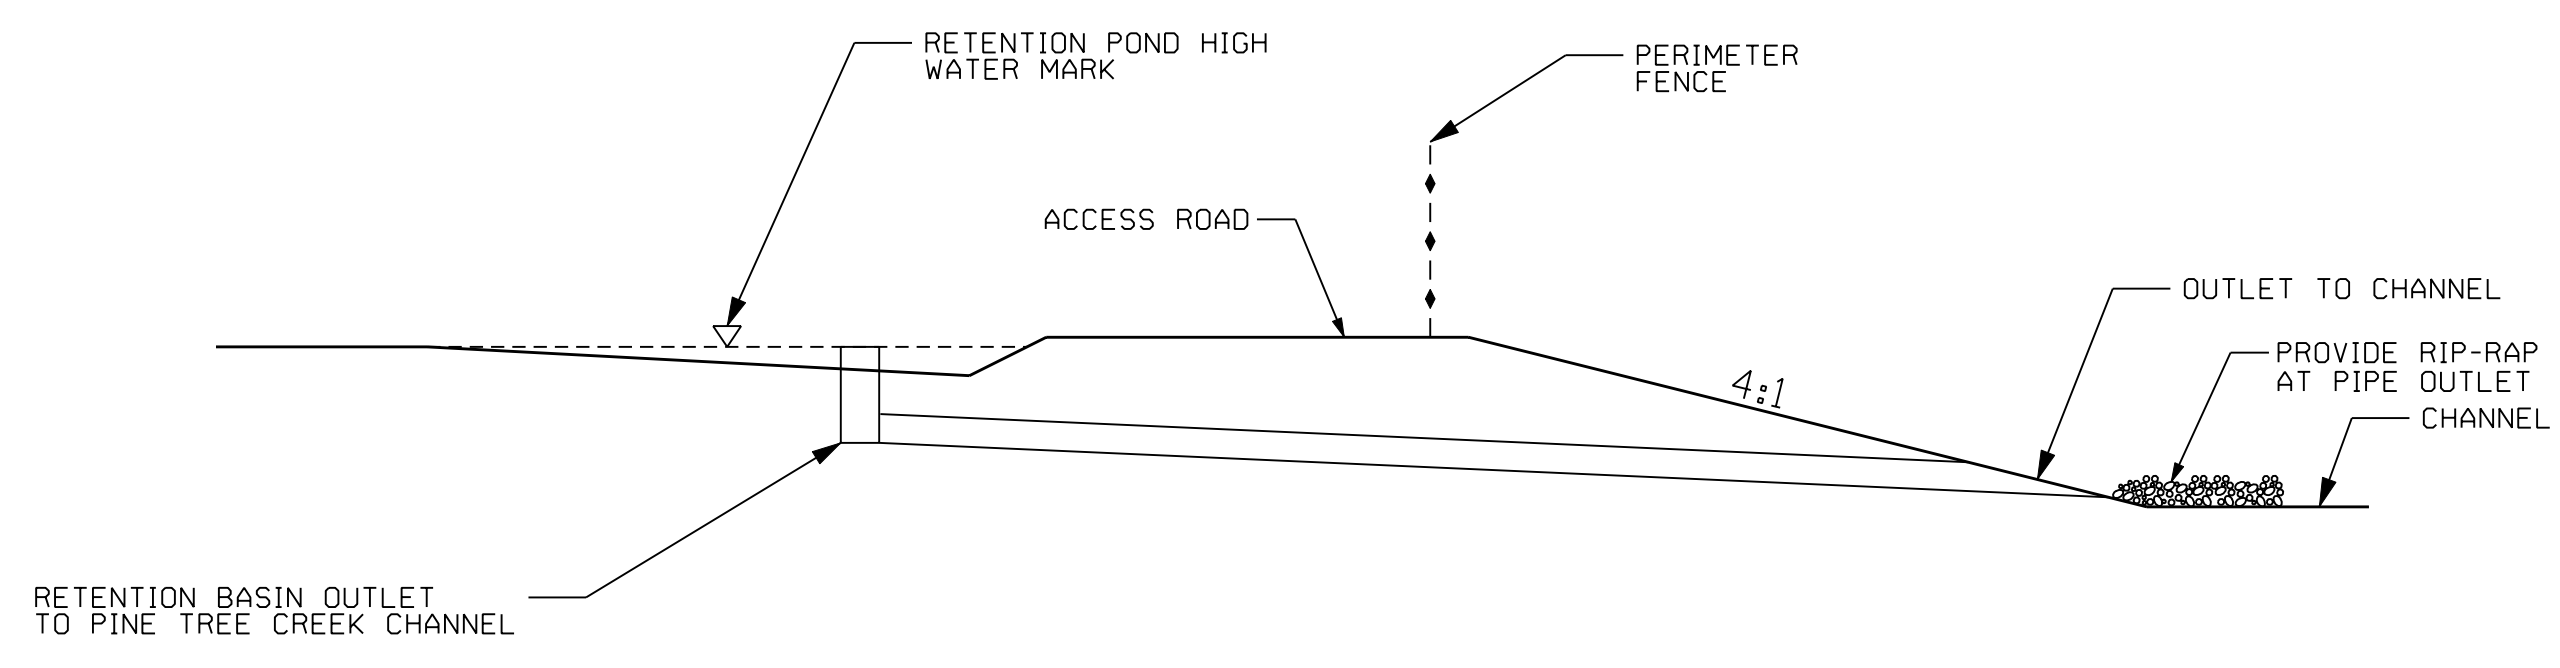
DETAIL A-A ACCESS ROAD AND CHANNEL DETAIL
